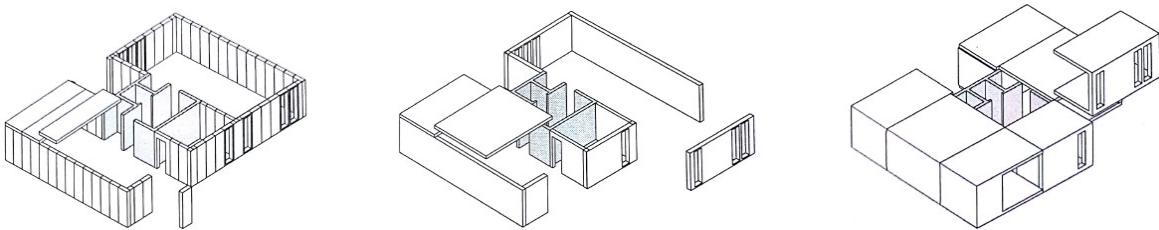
Case 6 - Apartments construction assembly scheme; 3xGruen apartments
